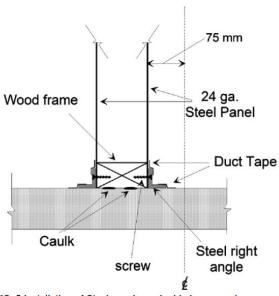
Installation of Steel panels as double layer specimen on a single wood frame. The centerline symbol, ¢, represents the midplane of the test opening between two rooms.
